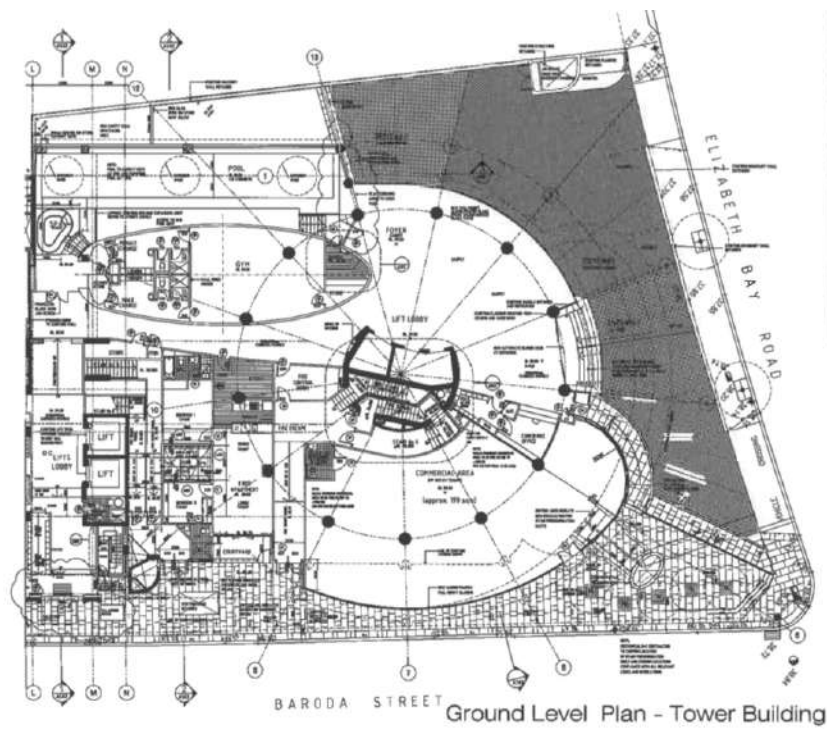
Group Architects Pty Limited, Gazebo Hotel Refurbishment Ground Floor Layout Plan, Drawing 0102 A253 S dated December 2004
